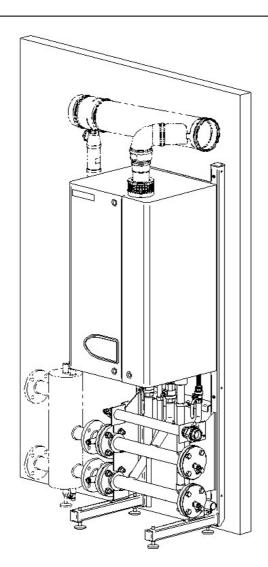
Single boiler arrangement showing boiler, frame, optional 2 port low loss header, optional flue header, water & gas pipe work for 40kW, 50kW, 60kW, 70kW, 85kW,100kW, 125kW, 150kW boiler outputs.
